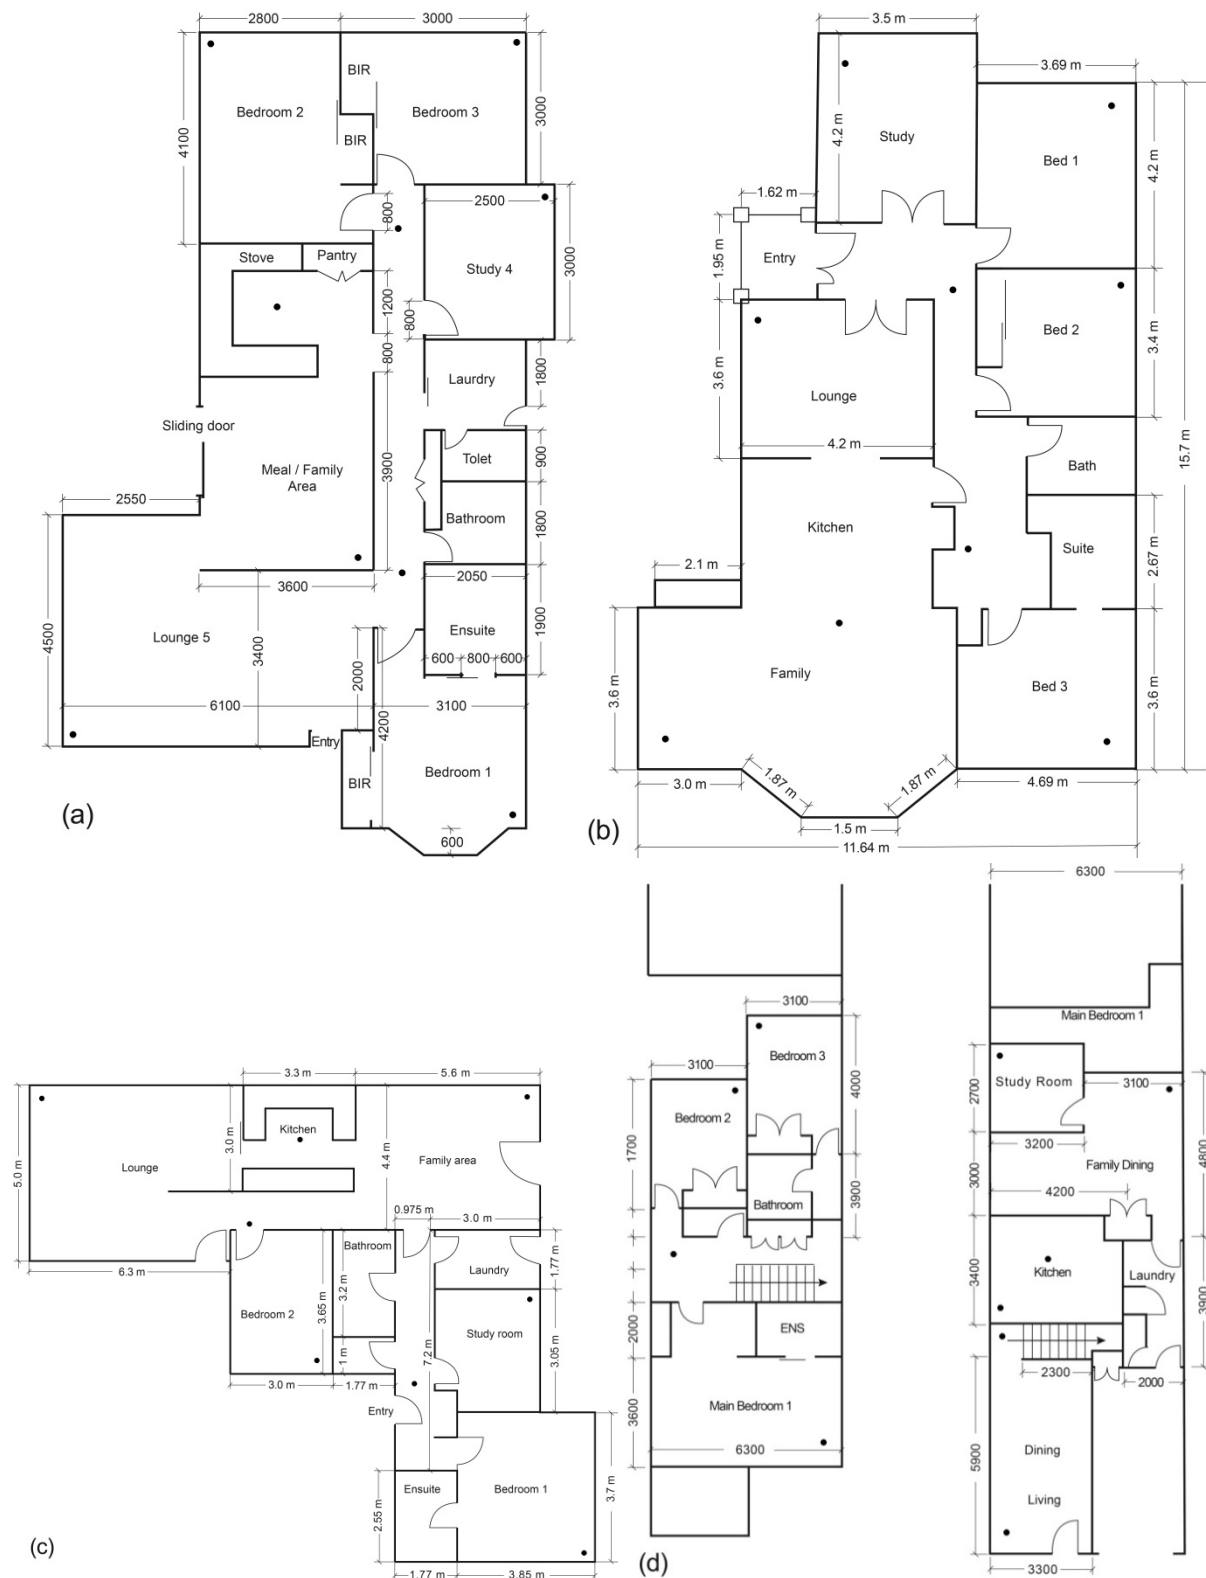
Plan for four types of houses: (a) House 1; (b) House 2; (c) House 3; and (d) House 4.
